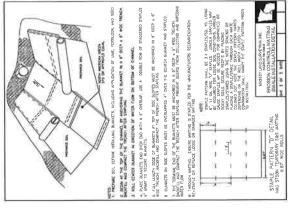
### DETAIL PLATES KASSON, MINNESOTA STONE RIDGE SECOND
